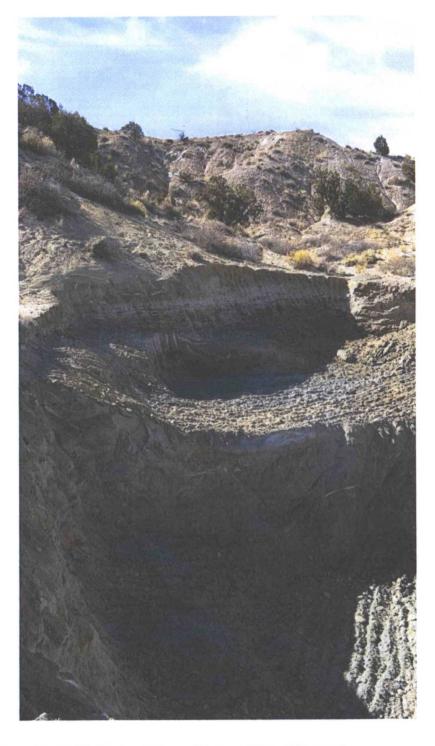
Krause WN Federal 2 Steep Western Edge of Excavation.
